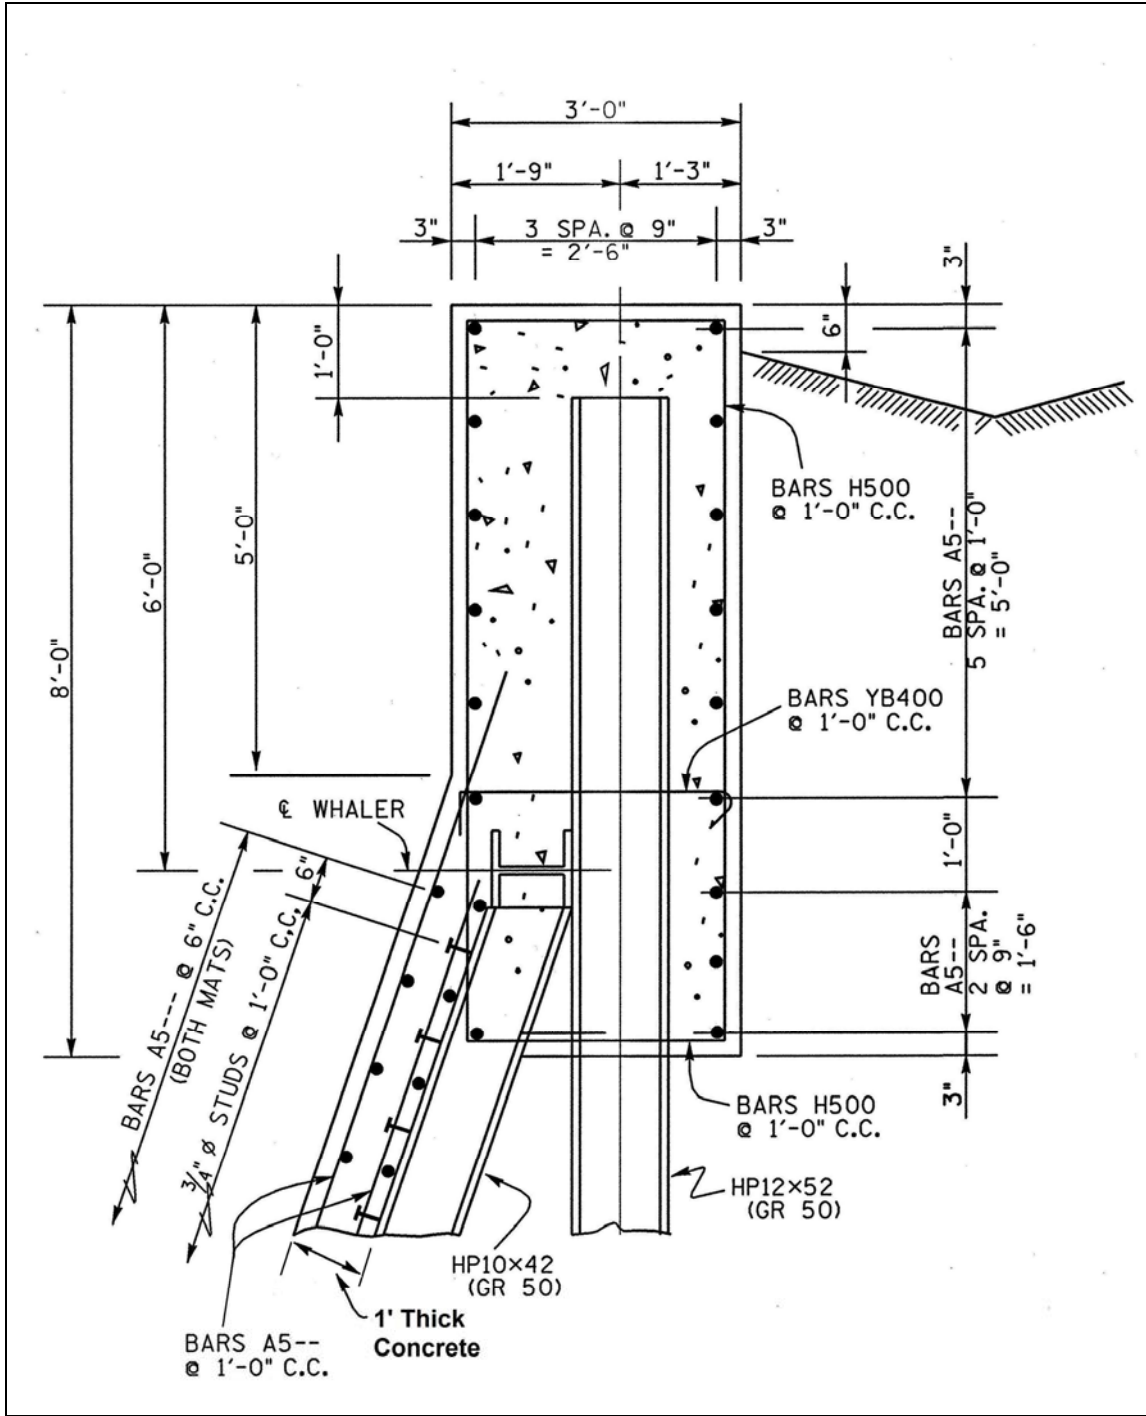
Typical Section of Wall Showing Composite Sections
